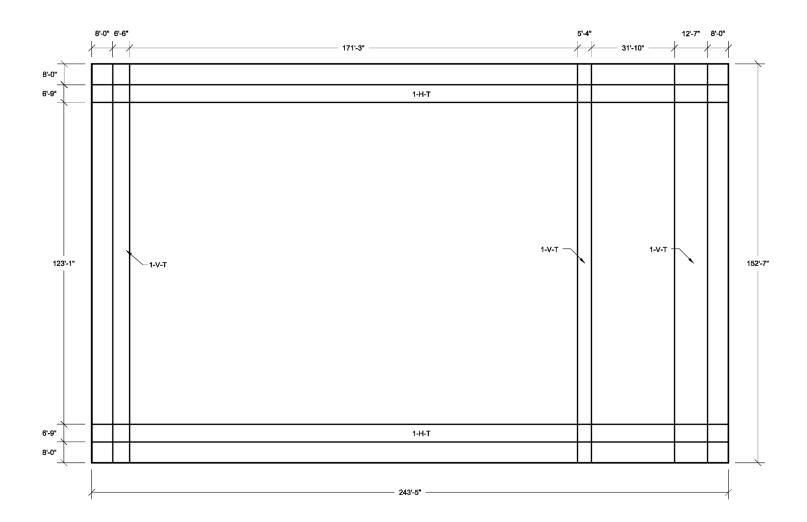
H.3-32 Basemat Looking Down Transverse Reinforcement Zones
